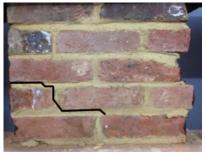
Failed masonry wallette showing location and extent of shear crack
